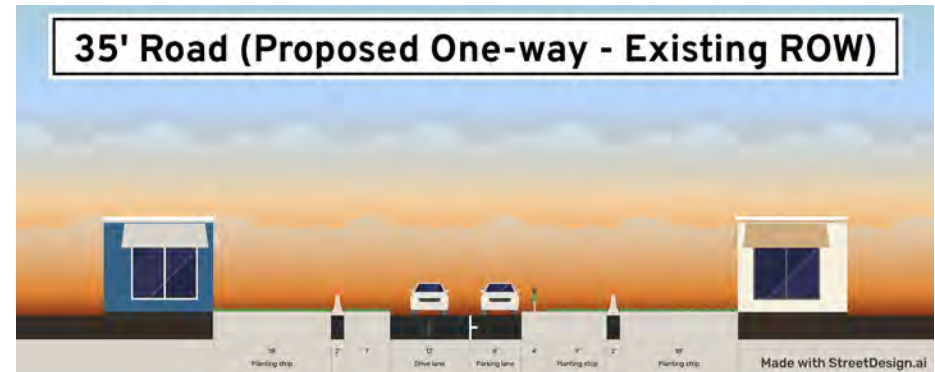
shows that a 35' street in Edgemont could be reconfigured within the existing right-of-way to include narrower roads, a 4' sidewalk on one side of the street, and vehicle parking on both sides of the road, helping improve pedestrian safety.
